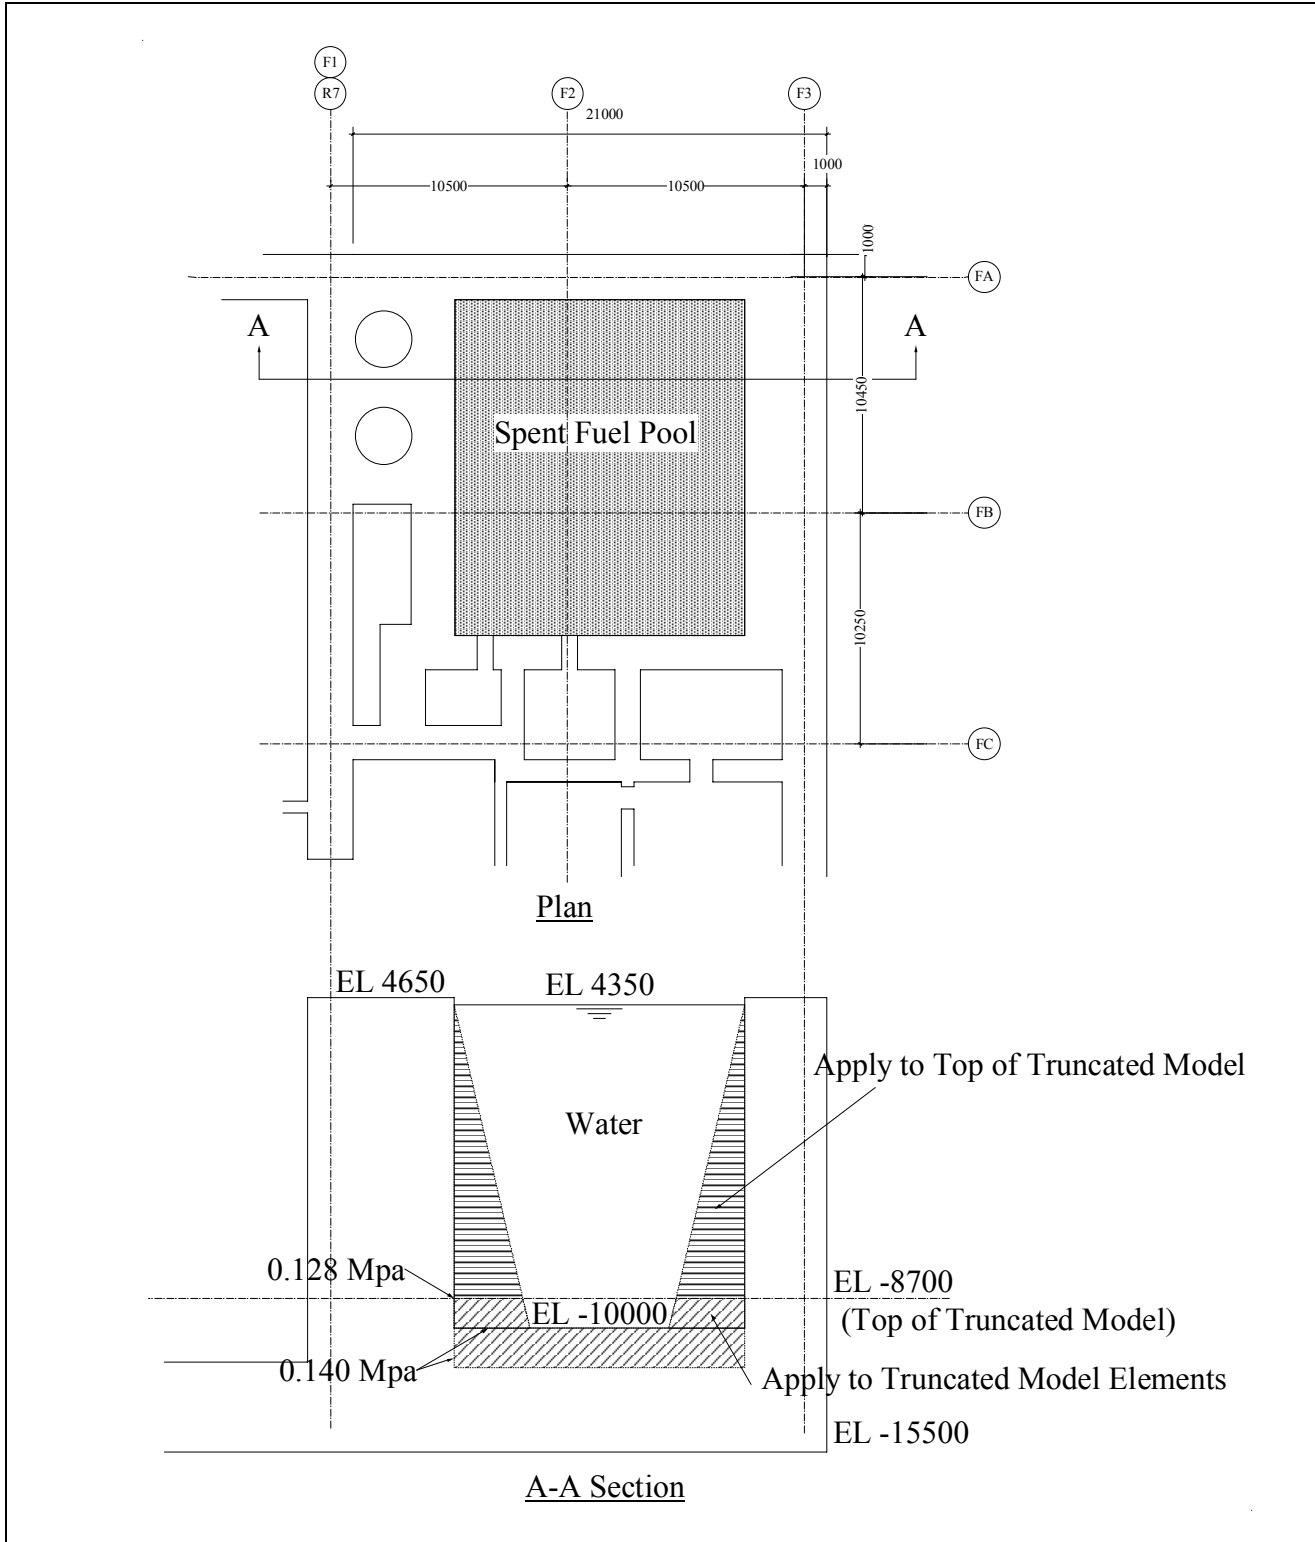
Hydrostatic Load Applied to the Spent Fuel Pool Walls and the Basemat
